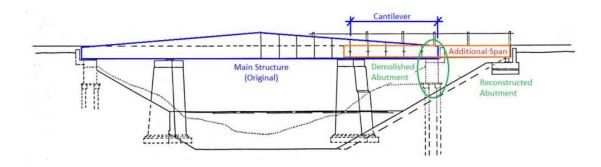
Chain Bridge - Elevation Extracted from Record Drawing
